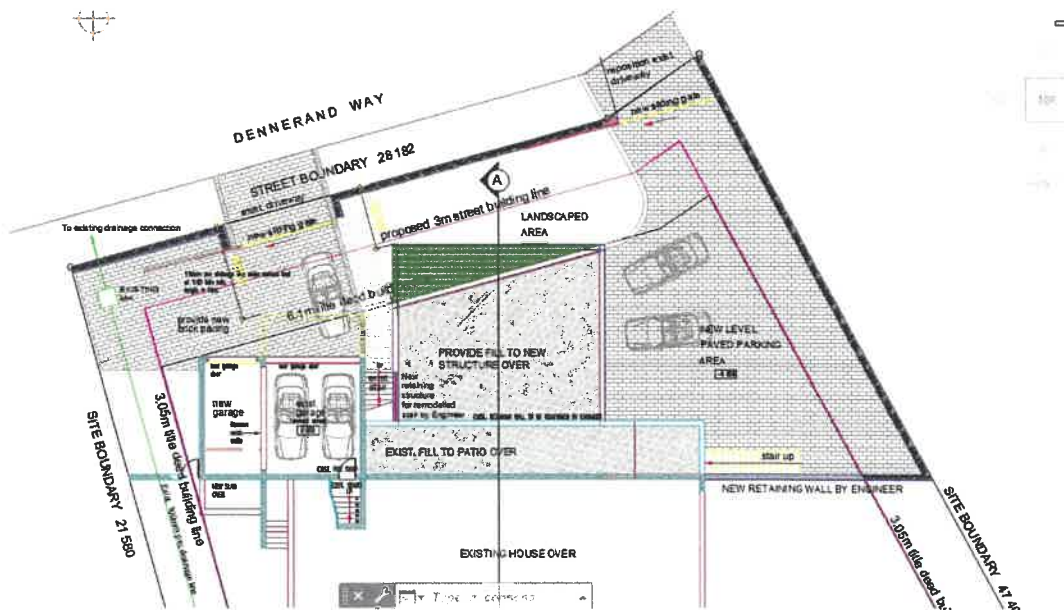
Proposed street building line encroachment: Lower Ground Floor
